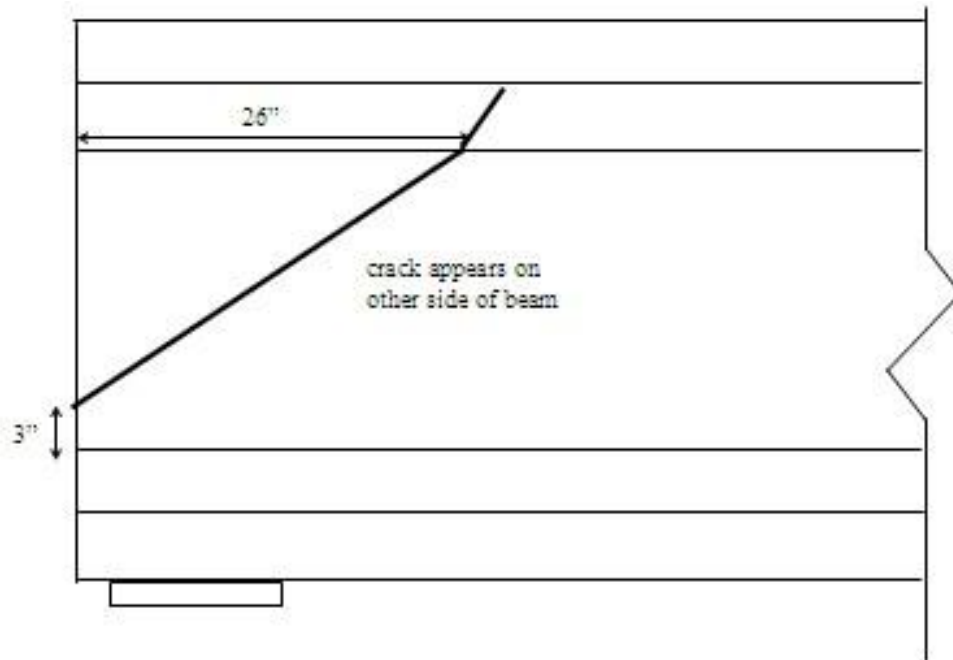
Crack diagram for north span, exterior girder on west side, west face, north abutment (#7933).
